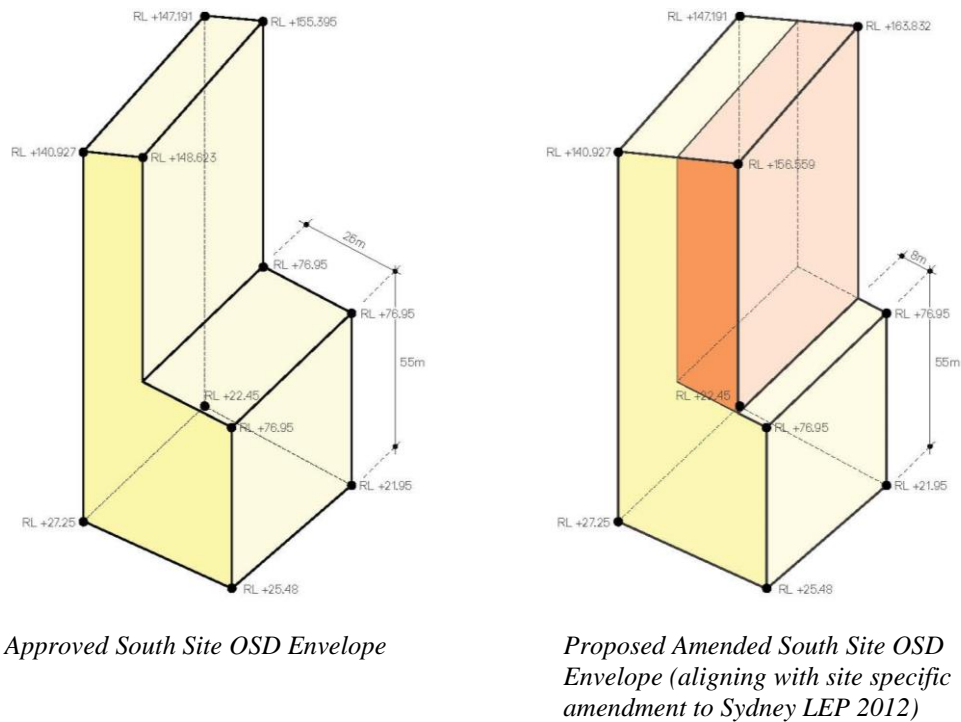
Relationship between the approved and proposed amended South Site building envelope
